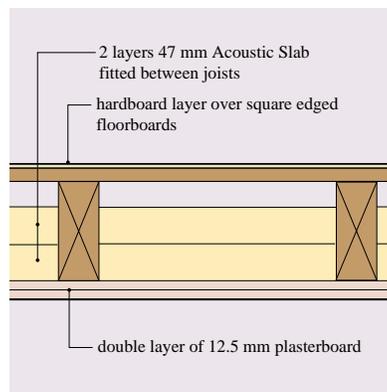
Upgrading the airborne sound insulation of a fixed timber floor using 2 layers of 47 mm Rockwool Acoustic Slab.
